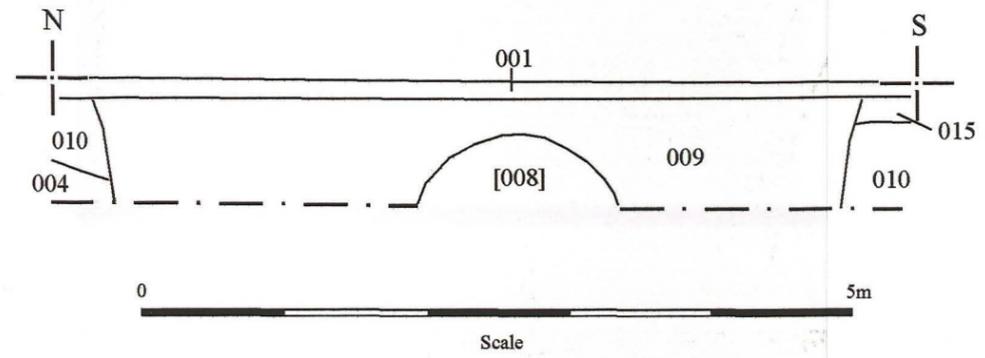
North facing sample section of the pipe-trench, recorded at ch. 20. Scale 1:20
